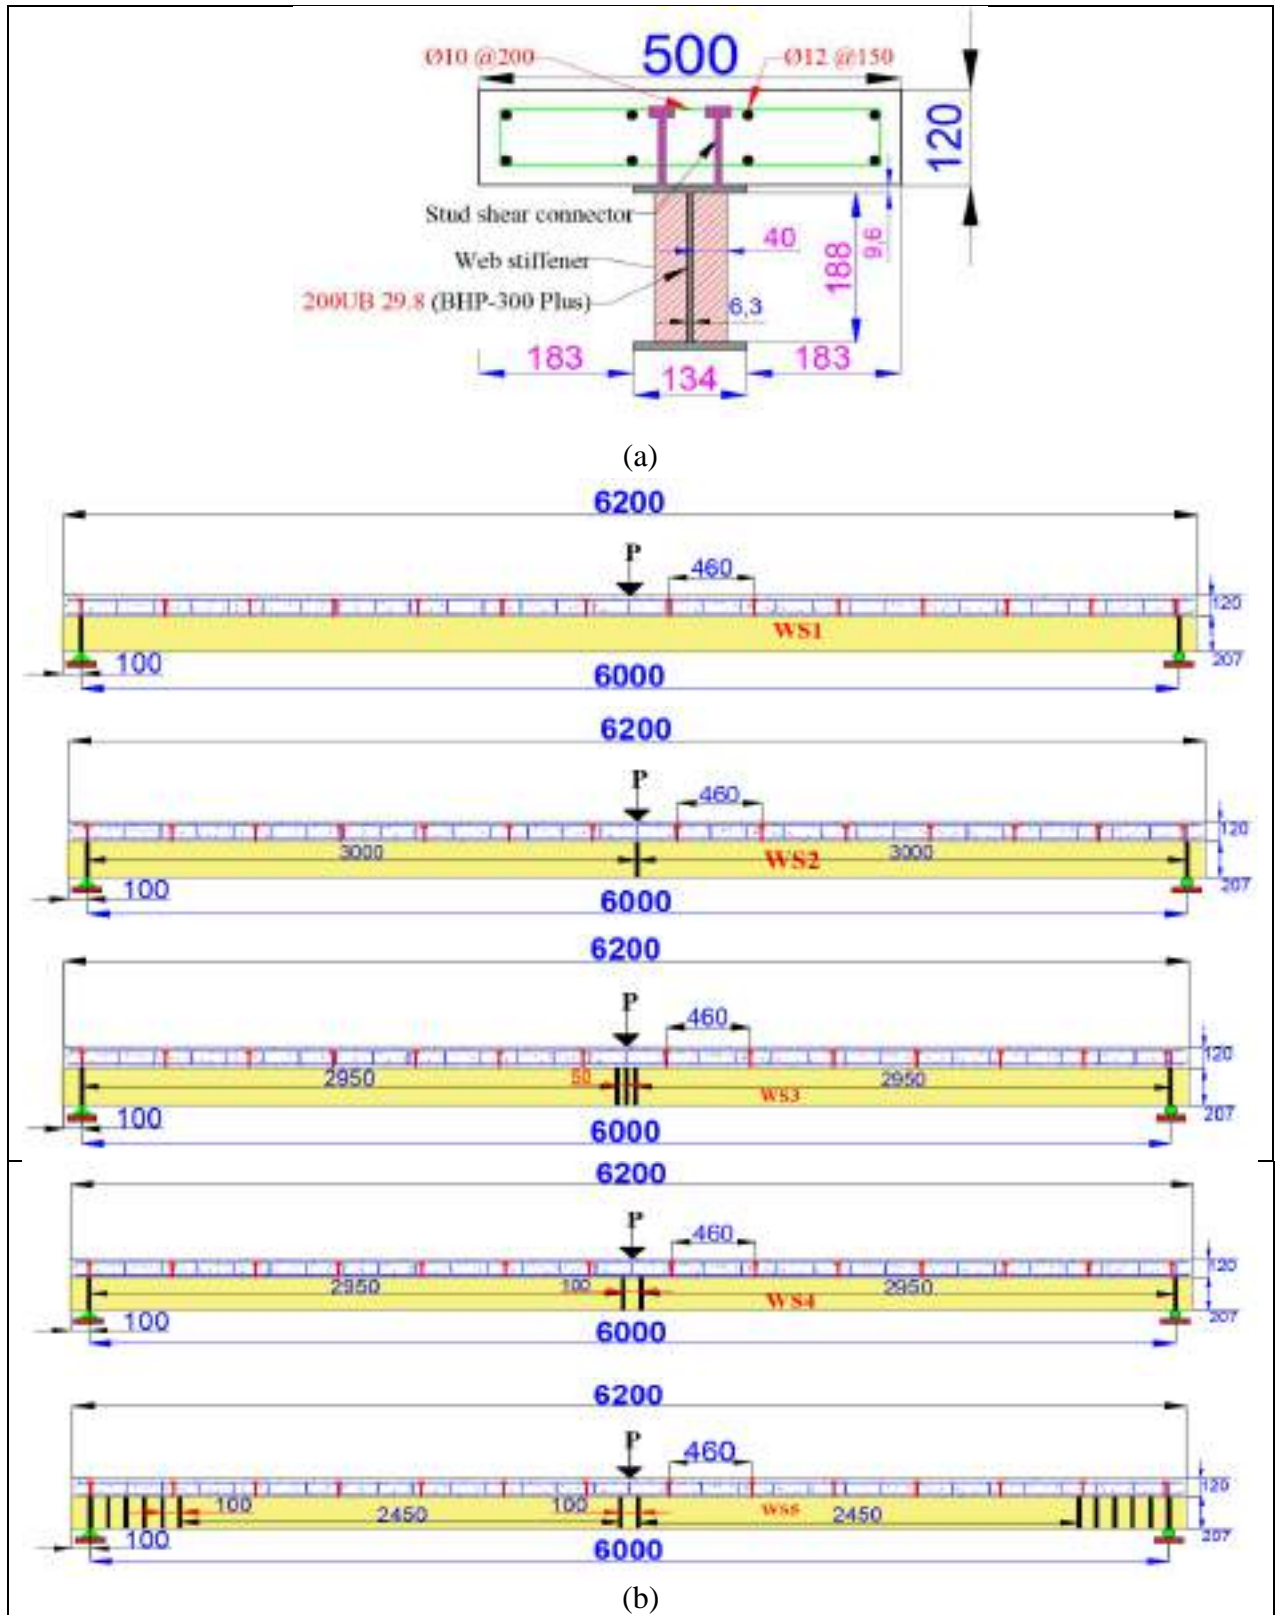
Geometry and dimensions of the curved composite steel–concrete beam with web stiffeners (unit: mm): a) Cross section, b) Side elevation.
